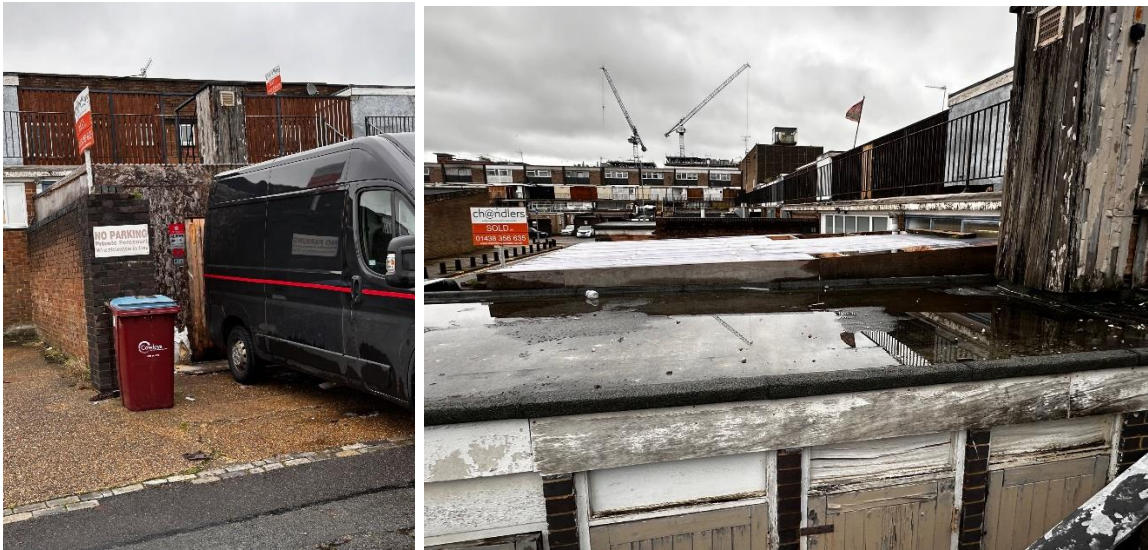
Photographs of existing extension (Photograph taken on 13/12/2023).
